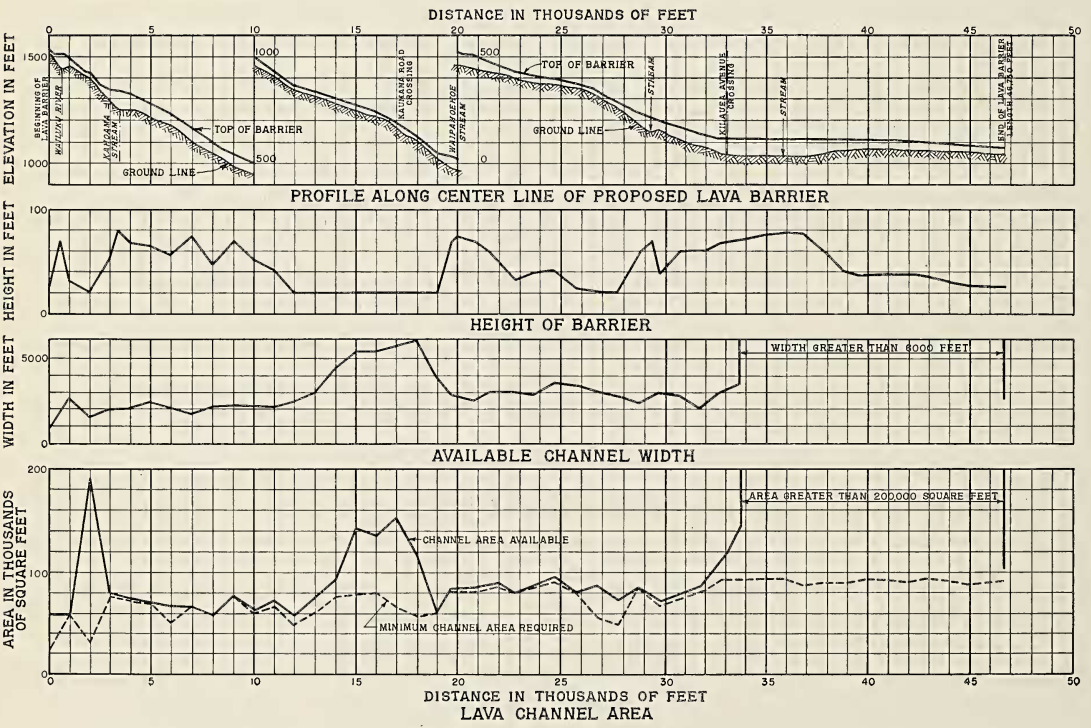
Drawings showing construction design, ground profile, height, channel width, and channel volume of the barrier designed by the U. S. Engineer Department in 1940. (After Jaggar, 1945, figs. 3, 4.)
